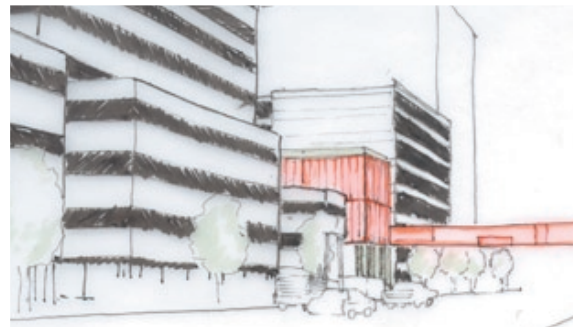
View from cnr. of Prinsloo Street and Pretorius Street
